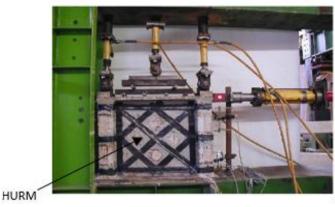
Setup for cyclic test of URM wall with diagonal CFRP strips (Roberto Capozucca 2011).
